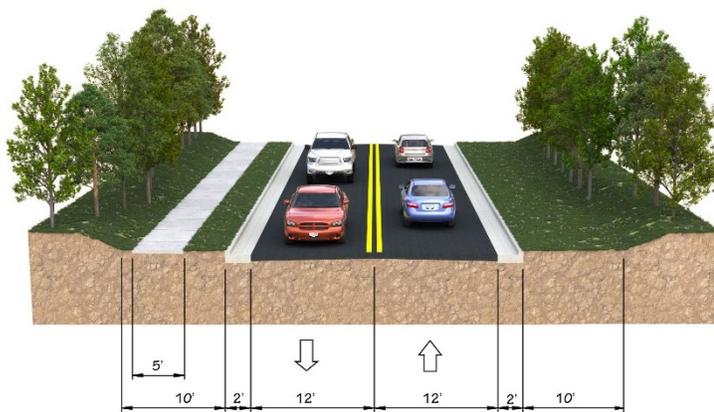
East Frederick Law Olmsted Way proposed typical section includes two 12-foot travel lanes, curb and gutter, and a five-foot concrete sidewalk on one side of the roadway.
